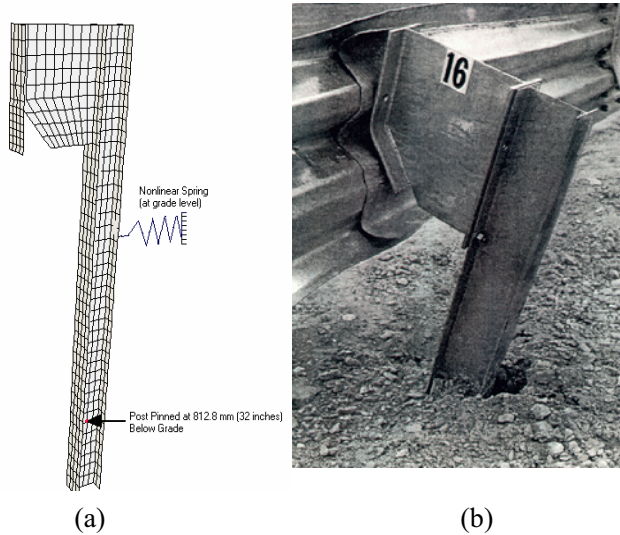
(a) Guardrail post-soil interaction modeled using nonlinear spring and (b) a record of the damage to guardrail after crash test 471470-30 [Dewey, et al. (1983)]
